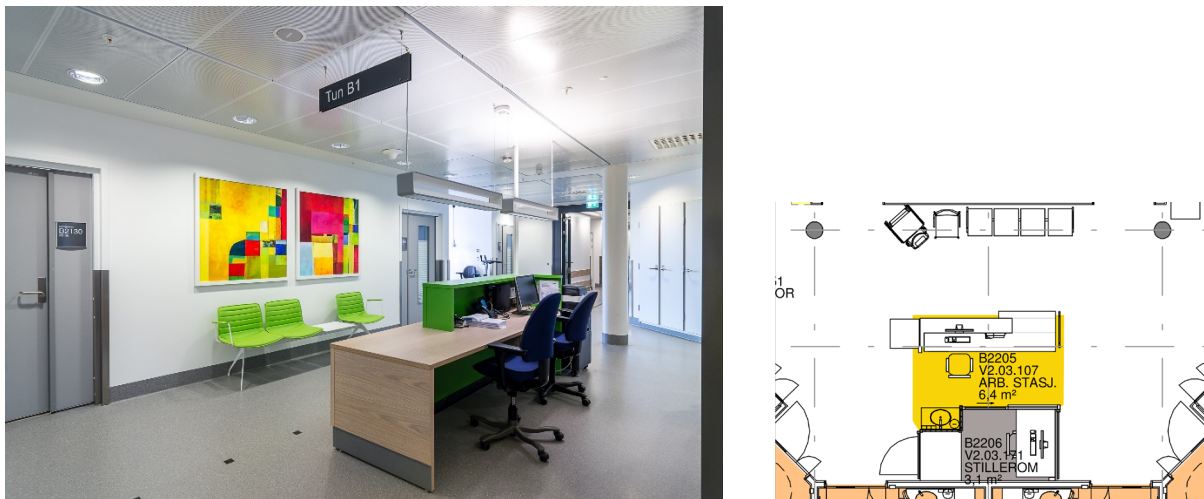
Vesterålen hospital workstation. Photo: Svein Erik Tøien – www.setoien.com, plan
